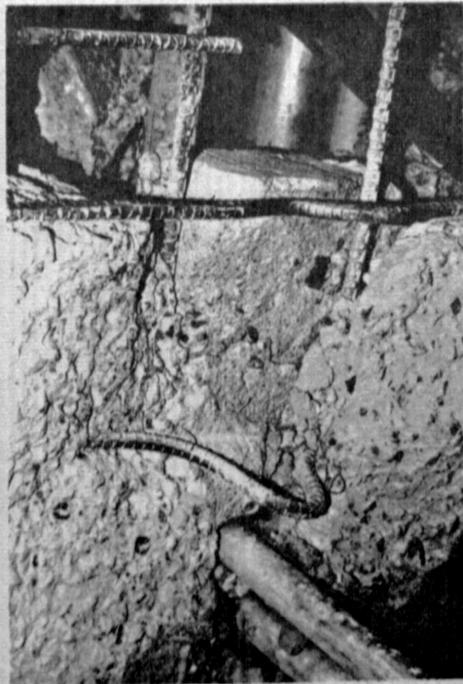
Hill Building. Concrete in core wall below first floor failed due to its exceptionally poor quality, causing core walls to rotate and damage partitions.
